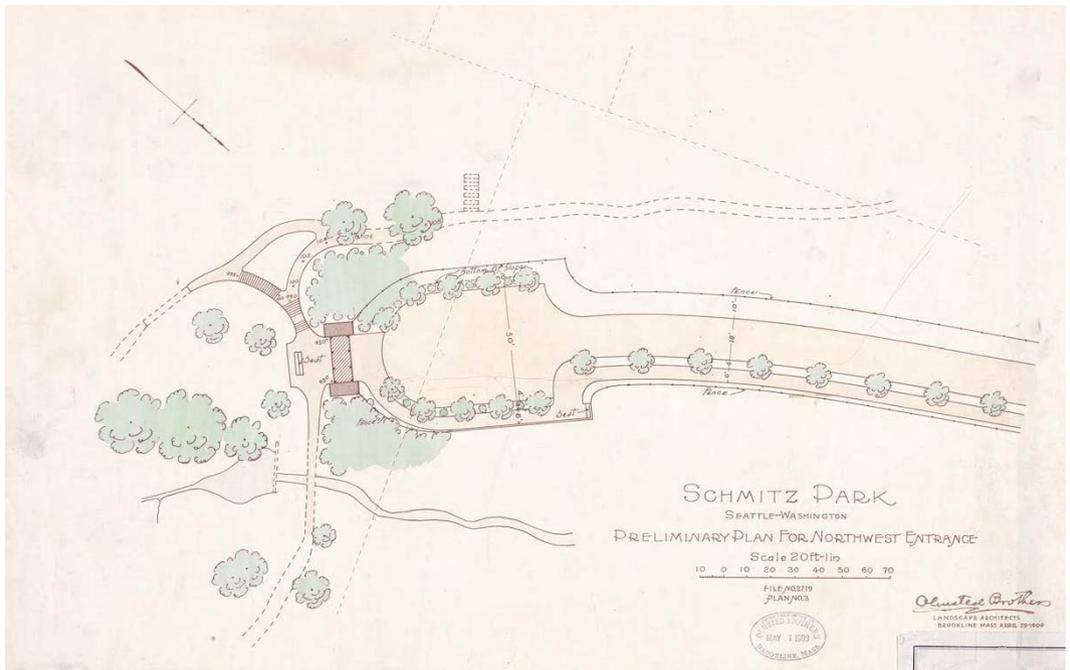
1909 PRELIMINARY PLAN FOR NORTHWEST ENTRANCE OF SCHMITZ PARK @ 1"=40'
